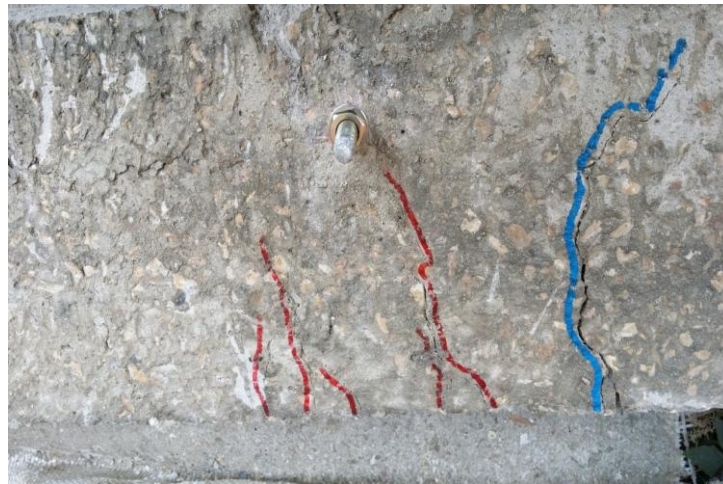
Cracks pattern for strengthened beams after removal of GFRP sheets G1-B
